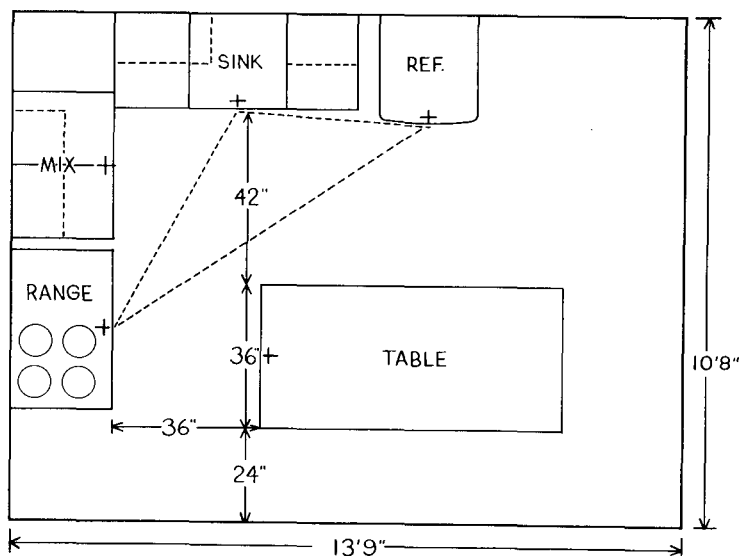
Floor Plan, Laboratory Arrangement 1.
